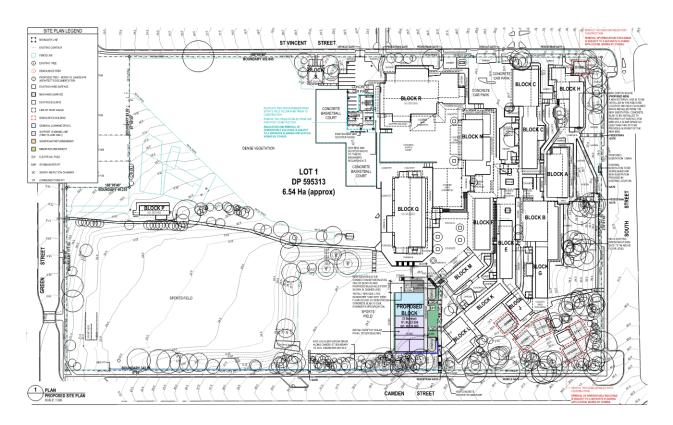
Site Plan - Source: Fulton Trotter, 2025
